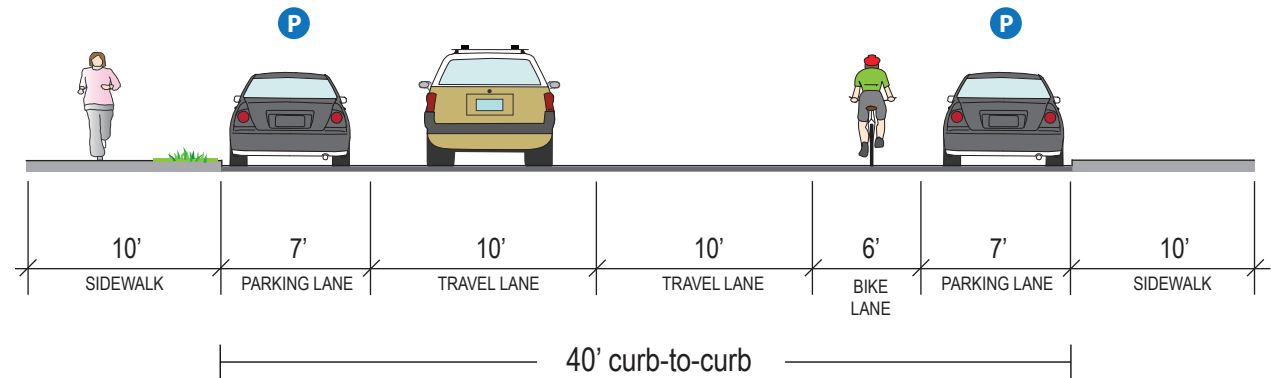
Existing street cross section between Hancock Street and Killingsworth Street
